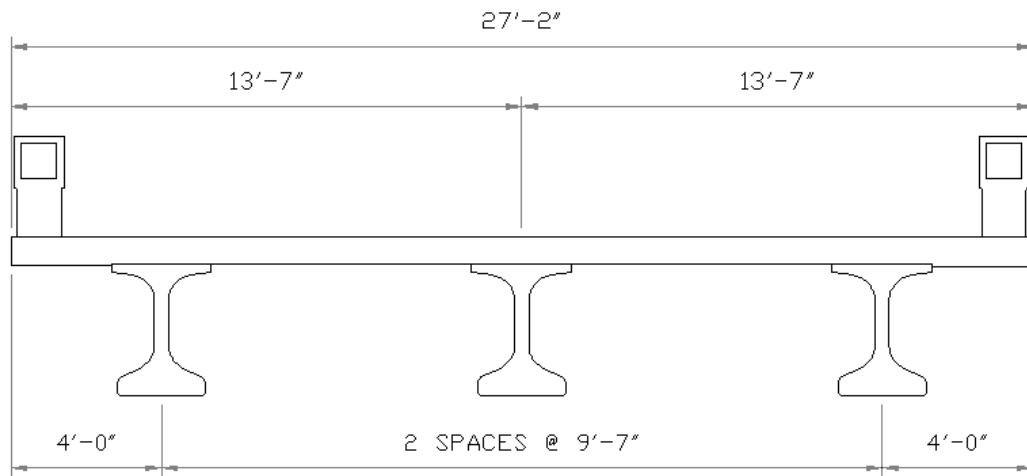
Mars Hill Bridge Cross-Section.
